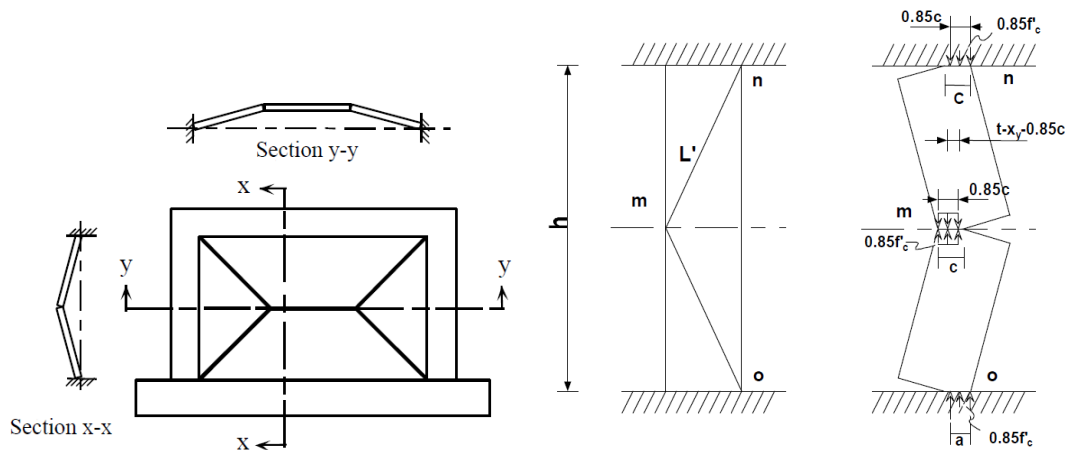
Limit equilibrium analysis in out-of plane failure of masonry infills [32]
